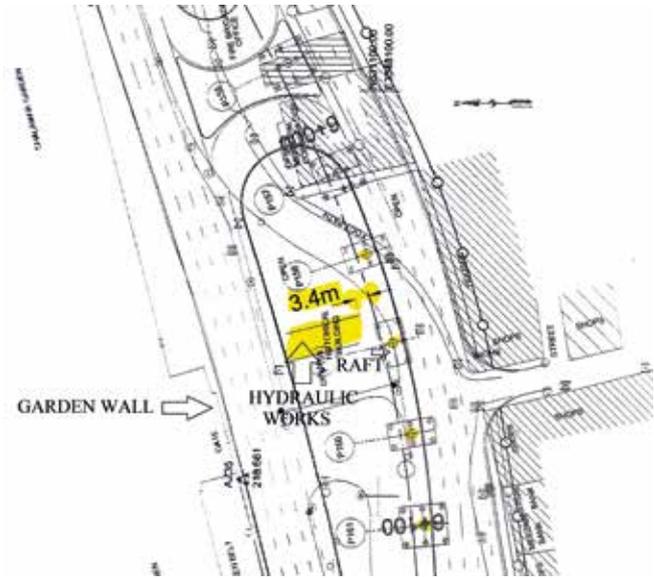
Nespak Map showing piers at 3.4 m from Hydraulic Works. Violation of 200 foot "Buffer Zone". The mammoth concrete structure of the station can be seen at the rear. Photo: Imrana Tiwana
